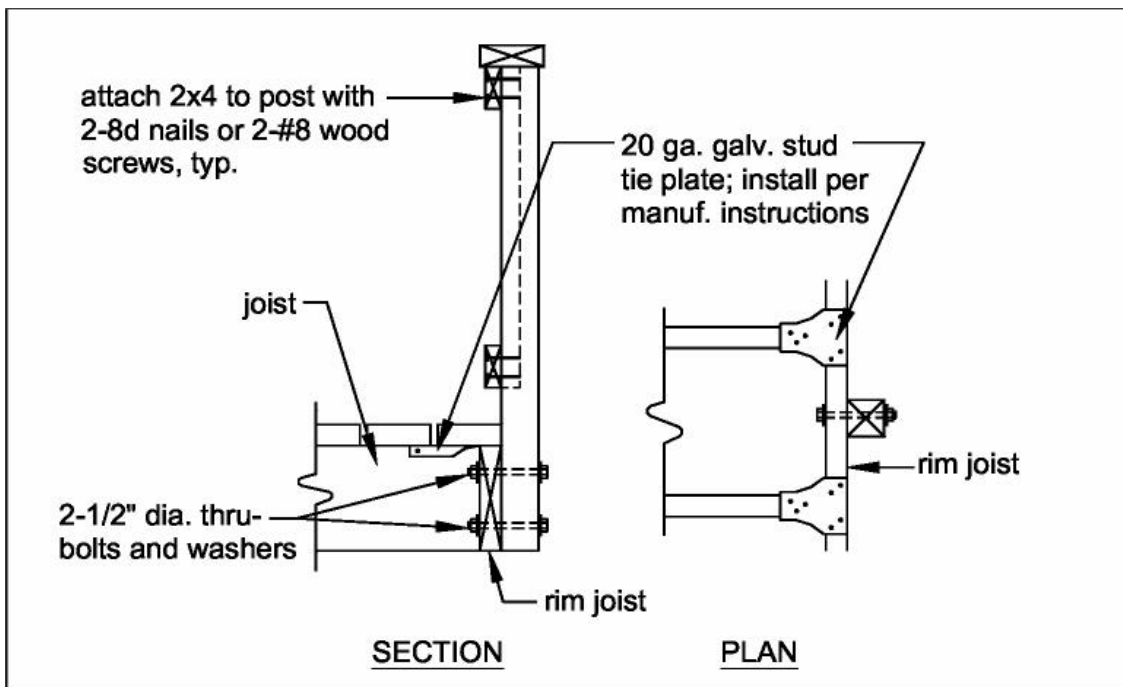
GUARD POST TO OUTSIDE JOIST DETAIL
